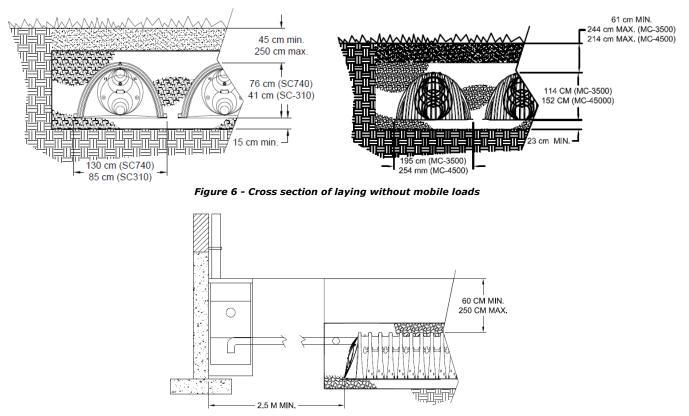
Example of a detached house application using STORMTECH SC310 chambers
